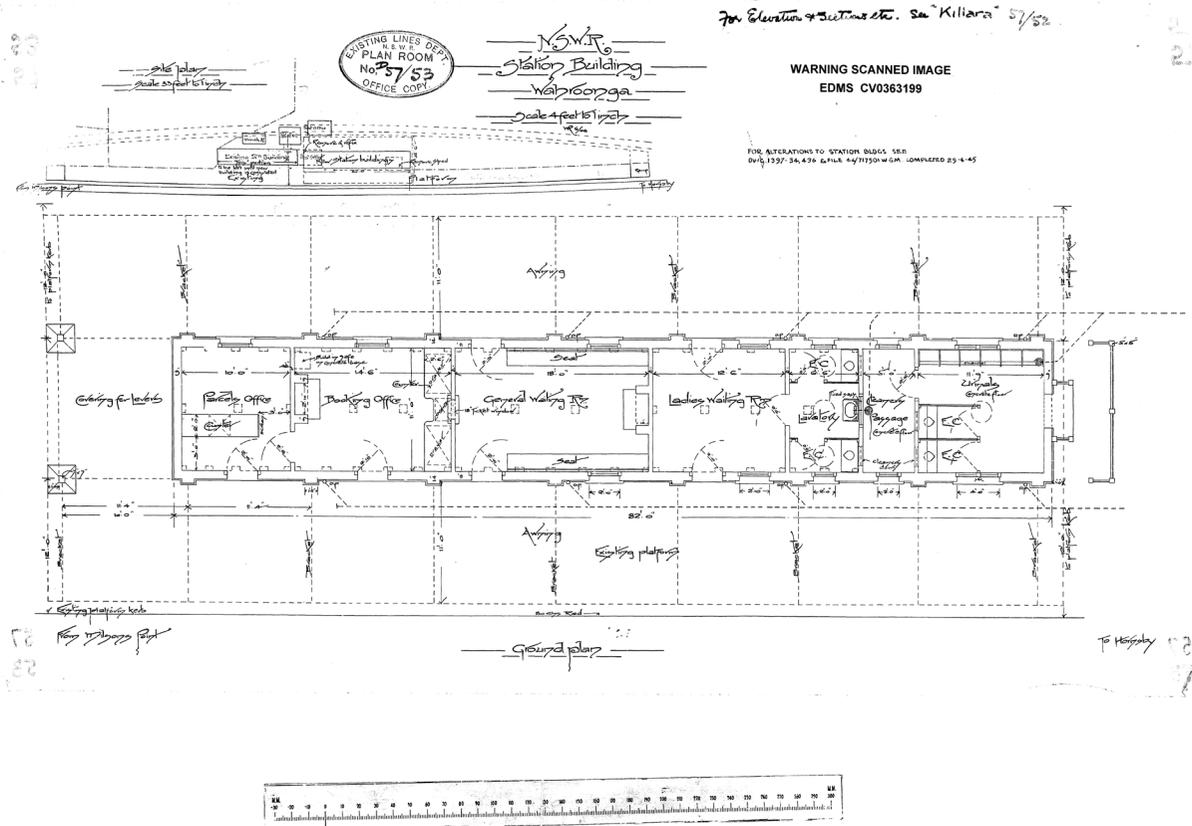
Plan 1908 (Source: Sharp 2018)
